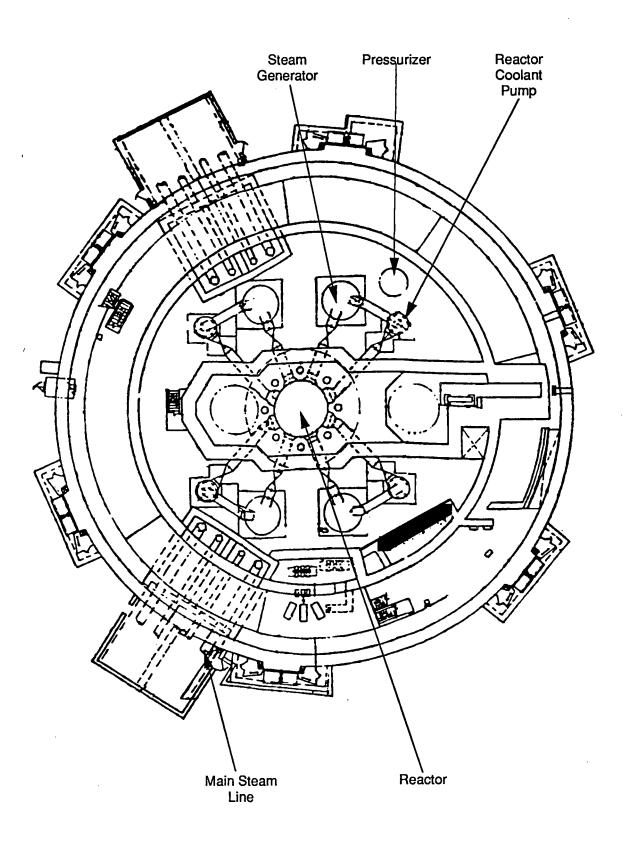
Zion 1 Containment, Elevation 590'0"
